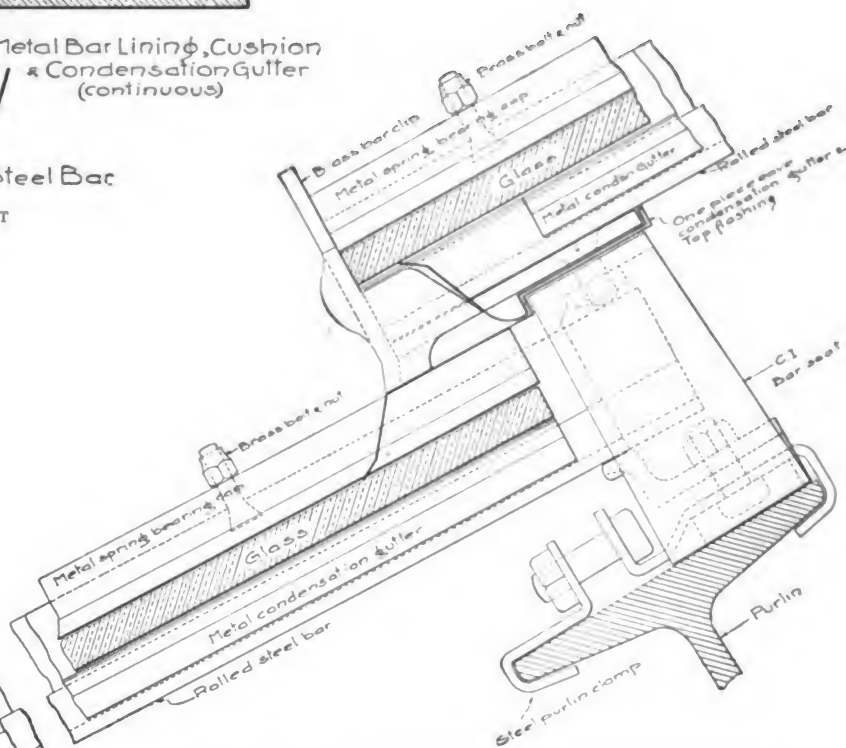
HALF-SIZE CROSS-SECTION FROM EAVE TO NEXT PURLIN
